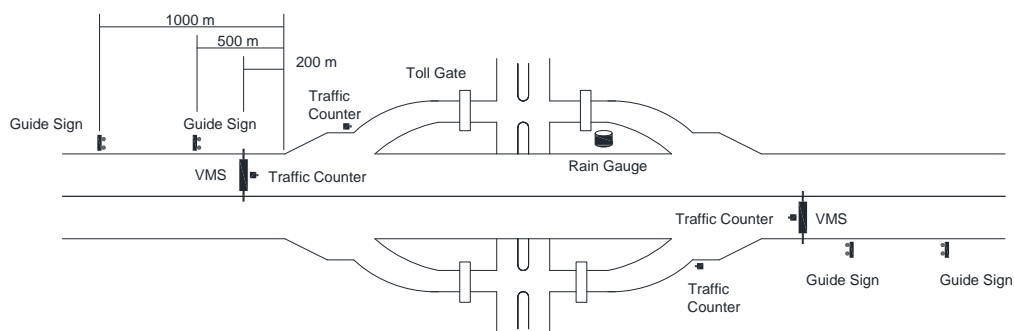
Typical Roadside Equipment Layout at a Diamond Interchange
